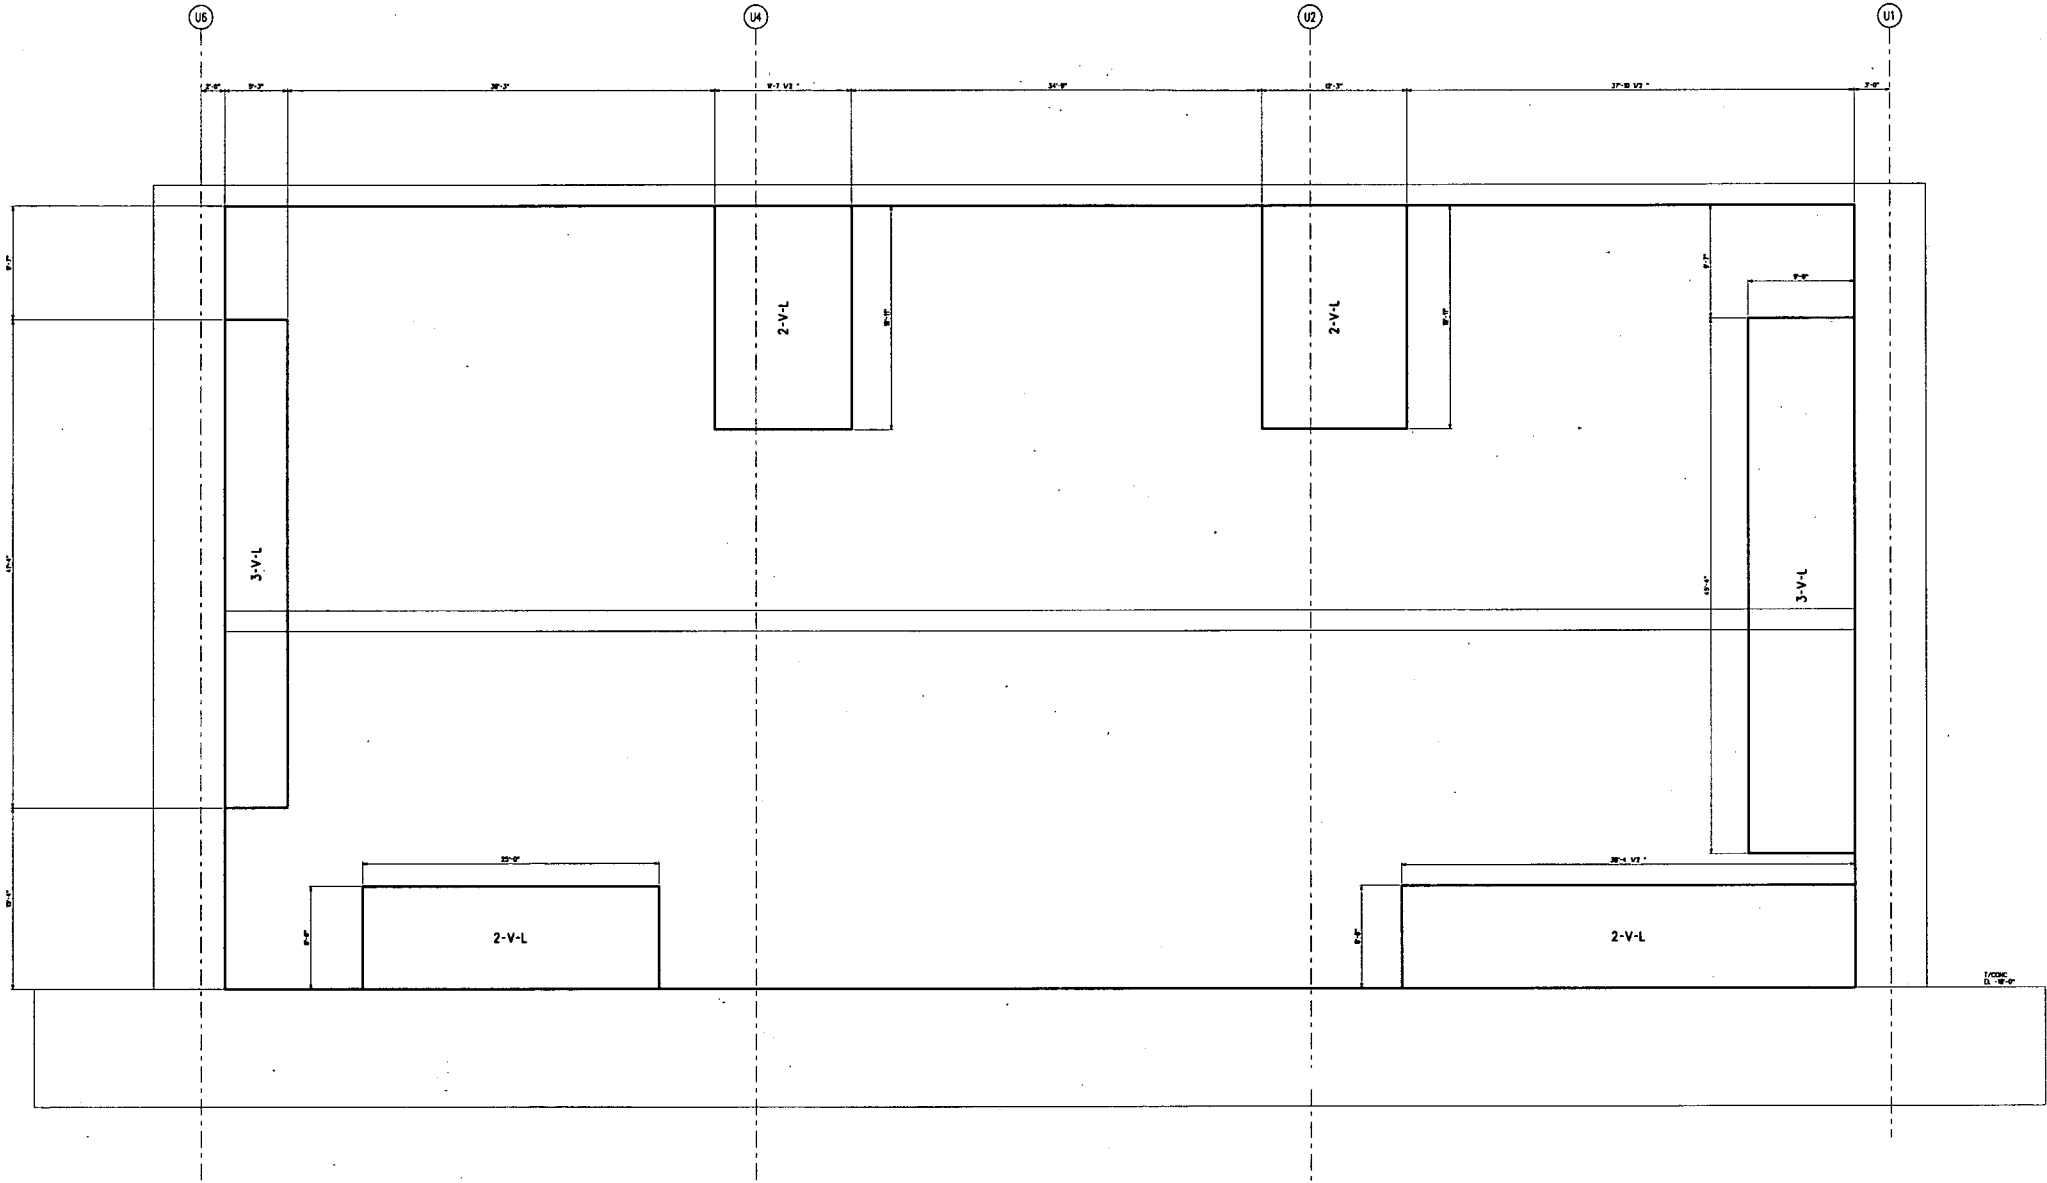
H.6-53: PUMPHOUSE NORTH WALL LOOKING SOUTH
